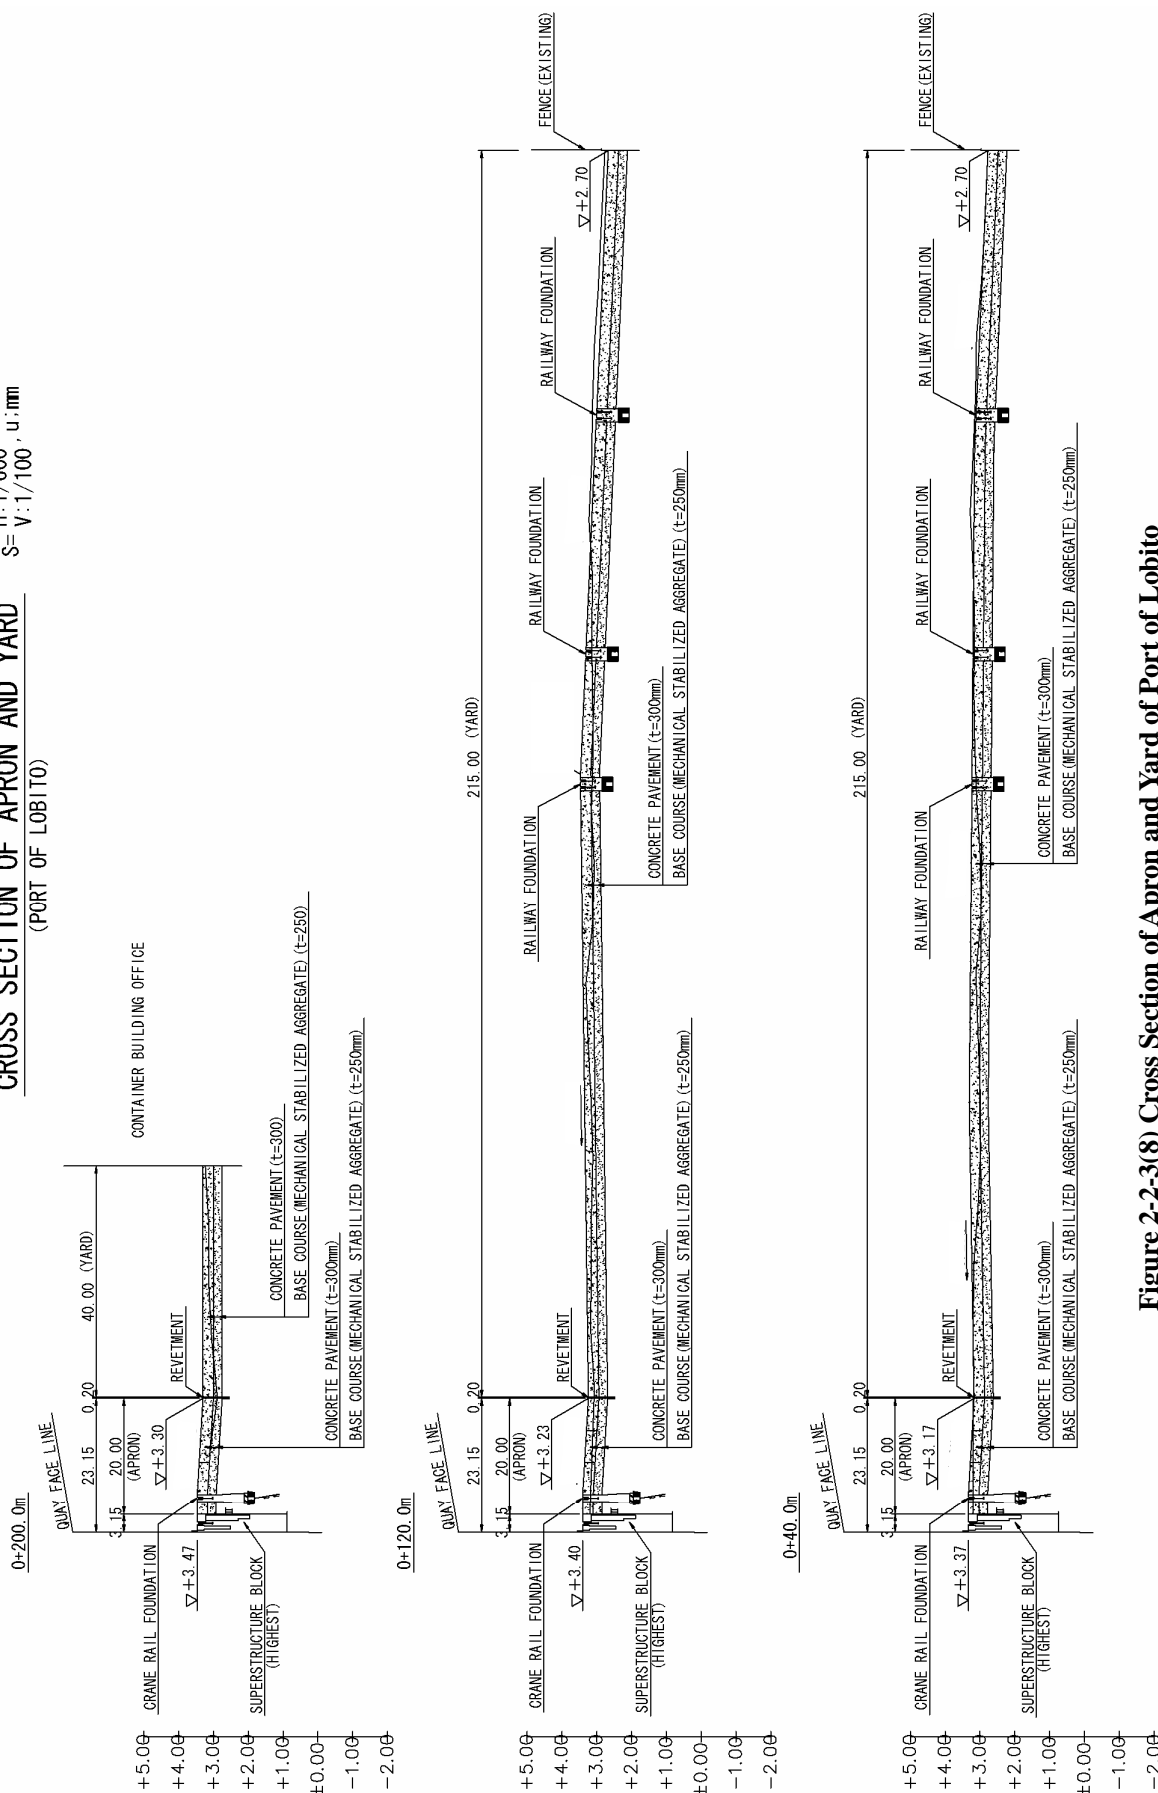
(8) Cross Section of Apron and Yard of Port of Lobito
